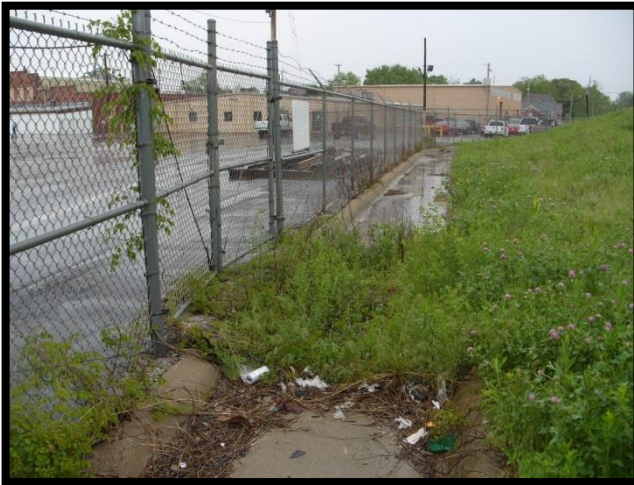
Concrete drainage swale, vegetation along northwestern side of Taracorp pile (view north/northeast).
